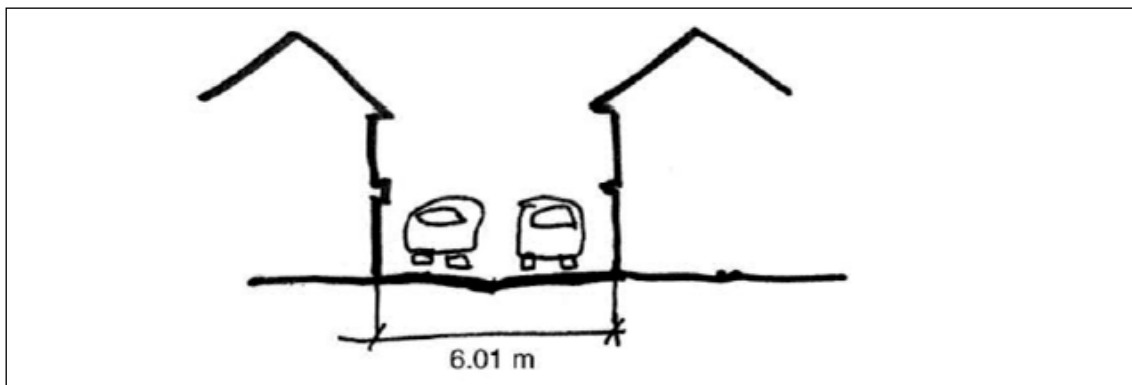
Sample Road Cross Section Laneway Rear Access
